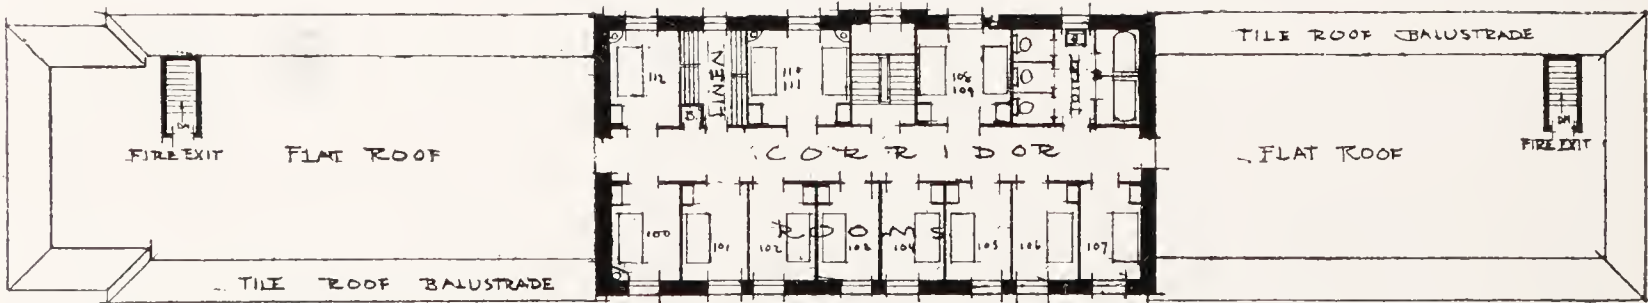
FOURTH FLOOR, PROPOSED HELP'S BUILDING, KINGS COUNTY HOSPITAL, NEW YORK, N. Y.
